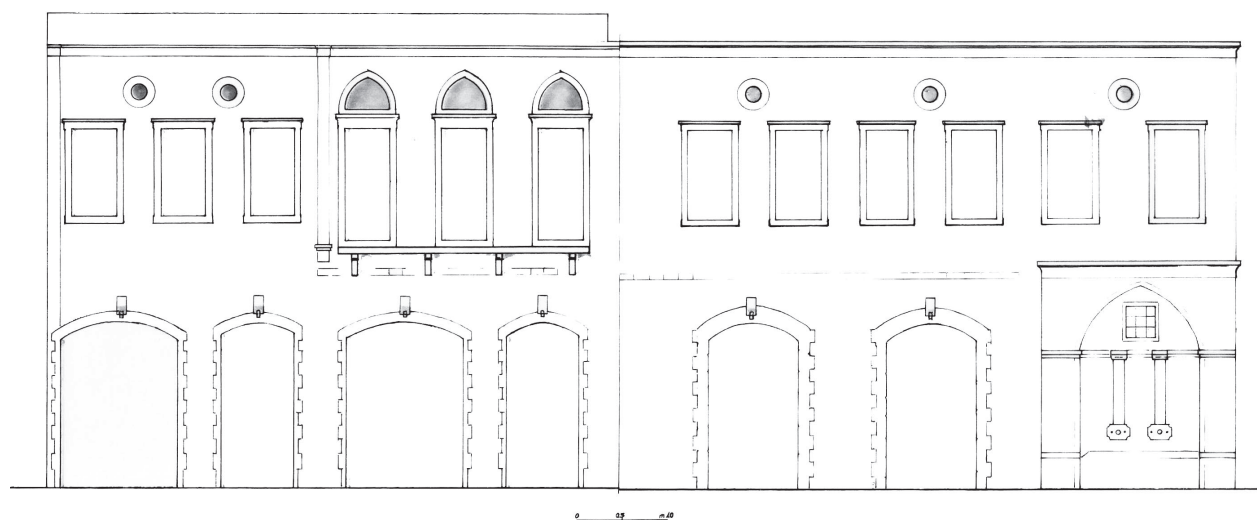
Façade of building on Ben Dosa St., Jaffa. In the right-hand corner of the structure is a *sabil* with two faucets (from Elharar and Cohen 2000:144).
